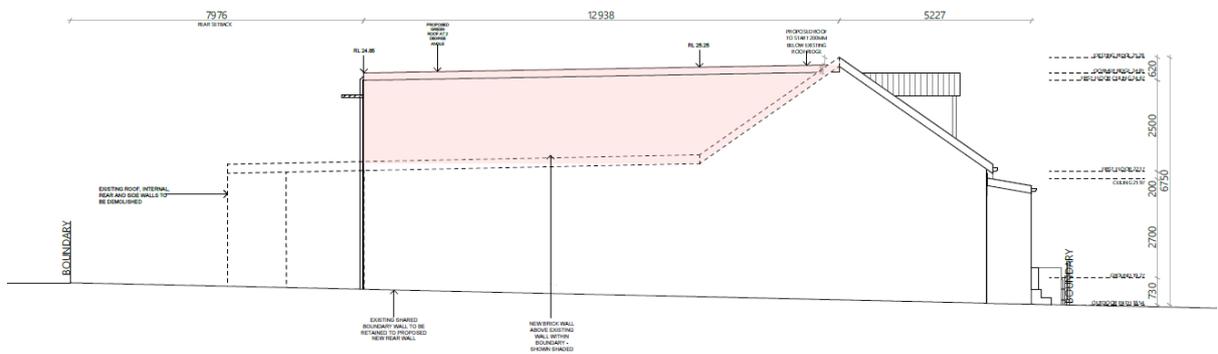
Proposed North Elevation (extent of new works outlined in red)
